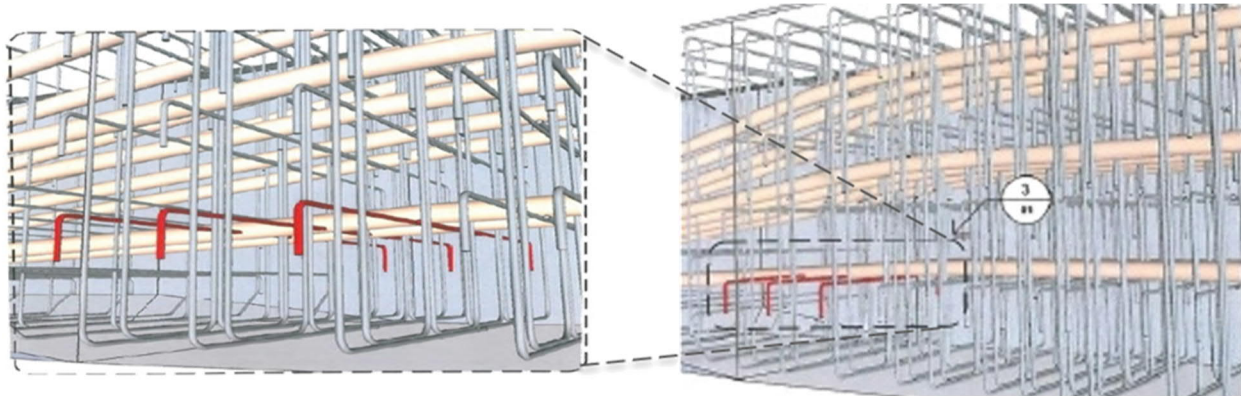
Micro-scale clash detection locating rebar through post-tensioning.
